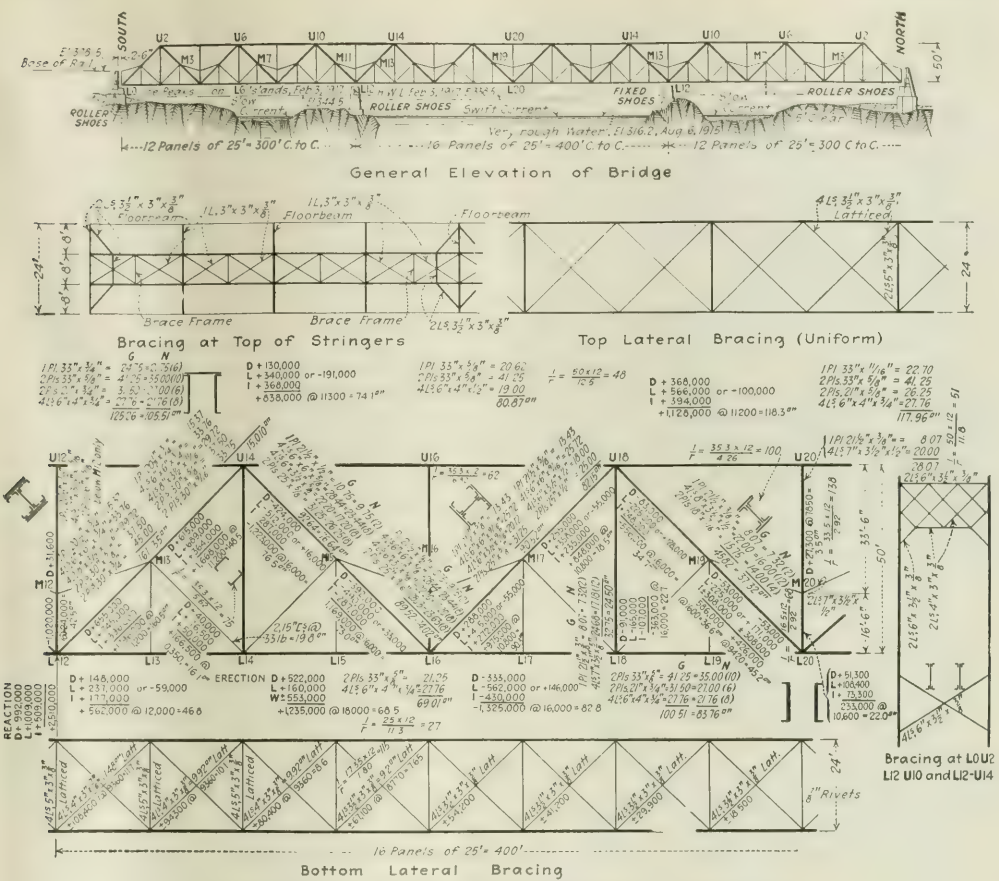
ELEVATION OF BRIDGE AND STRESS SHEET OF MAIN SPAN
